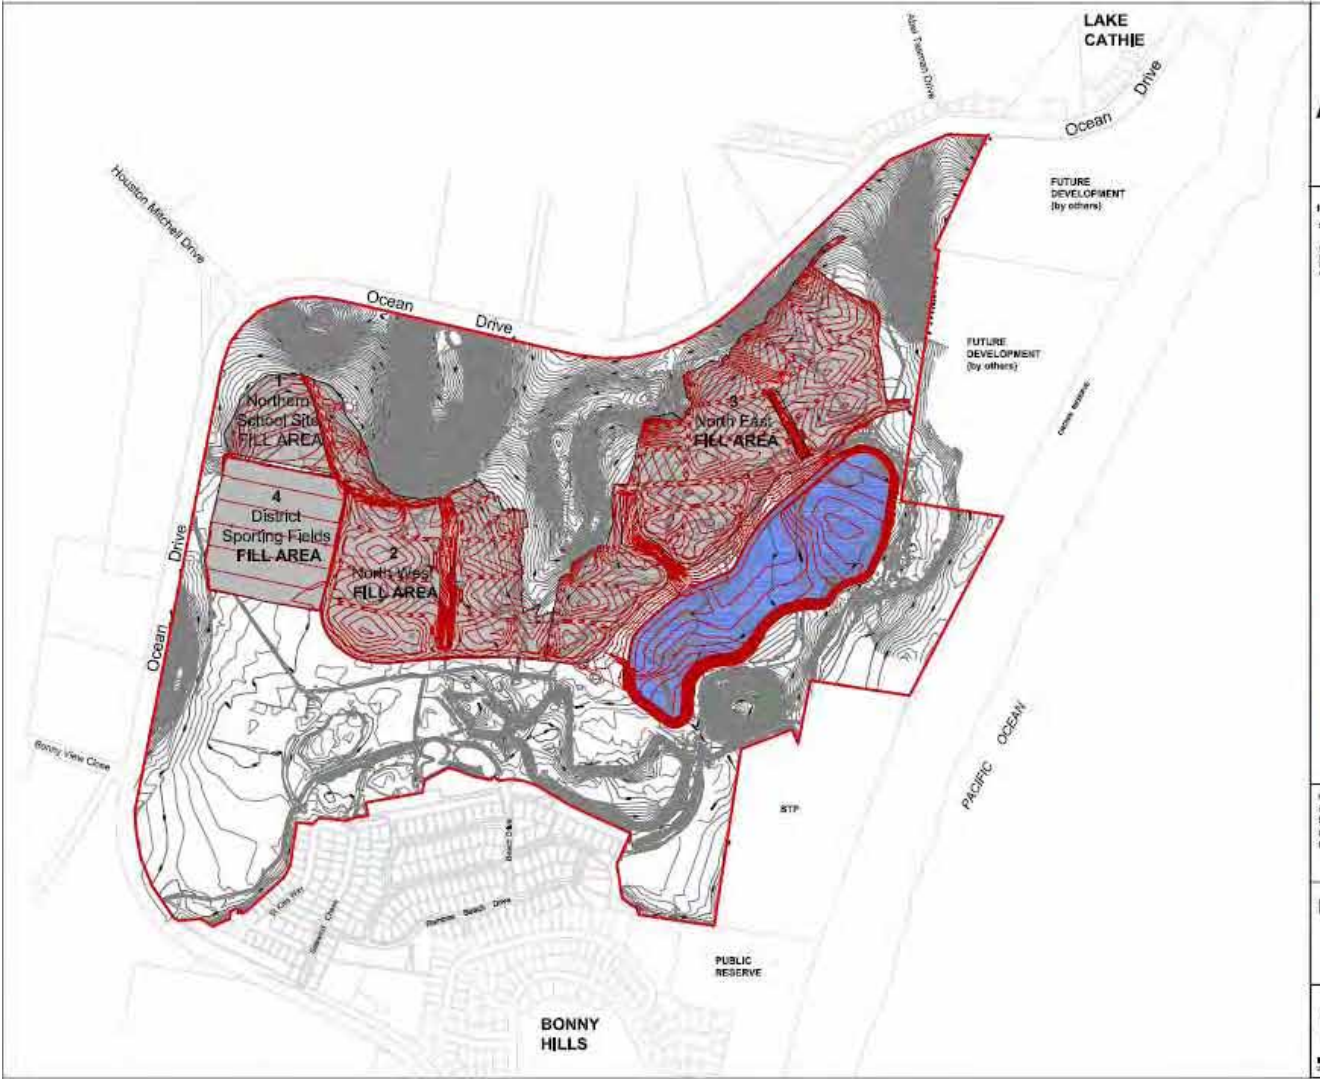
Project Application Plan - proposed excavation/wetland and filling.
